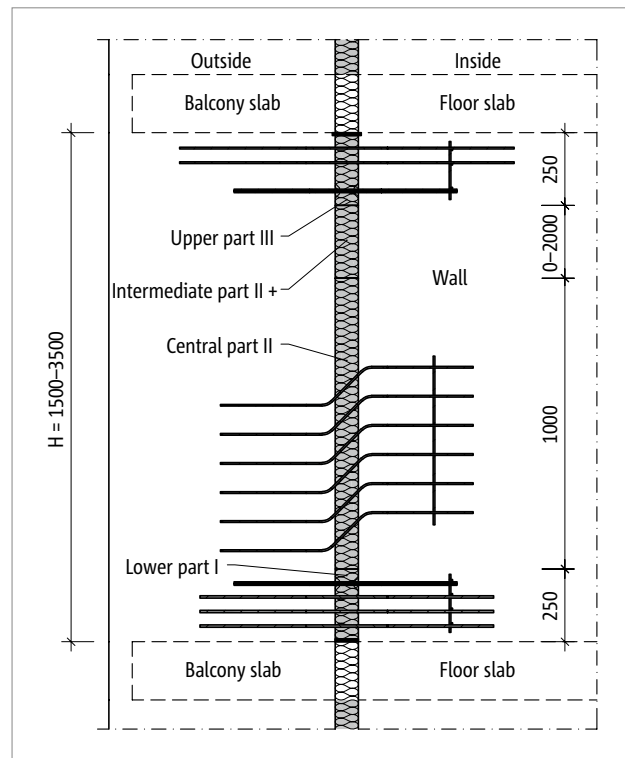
Schöck Isokorb® T type W: Balcony structure with thermal insulated load-bearing shear walls
